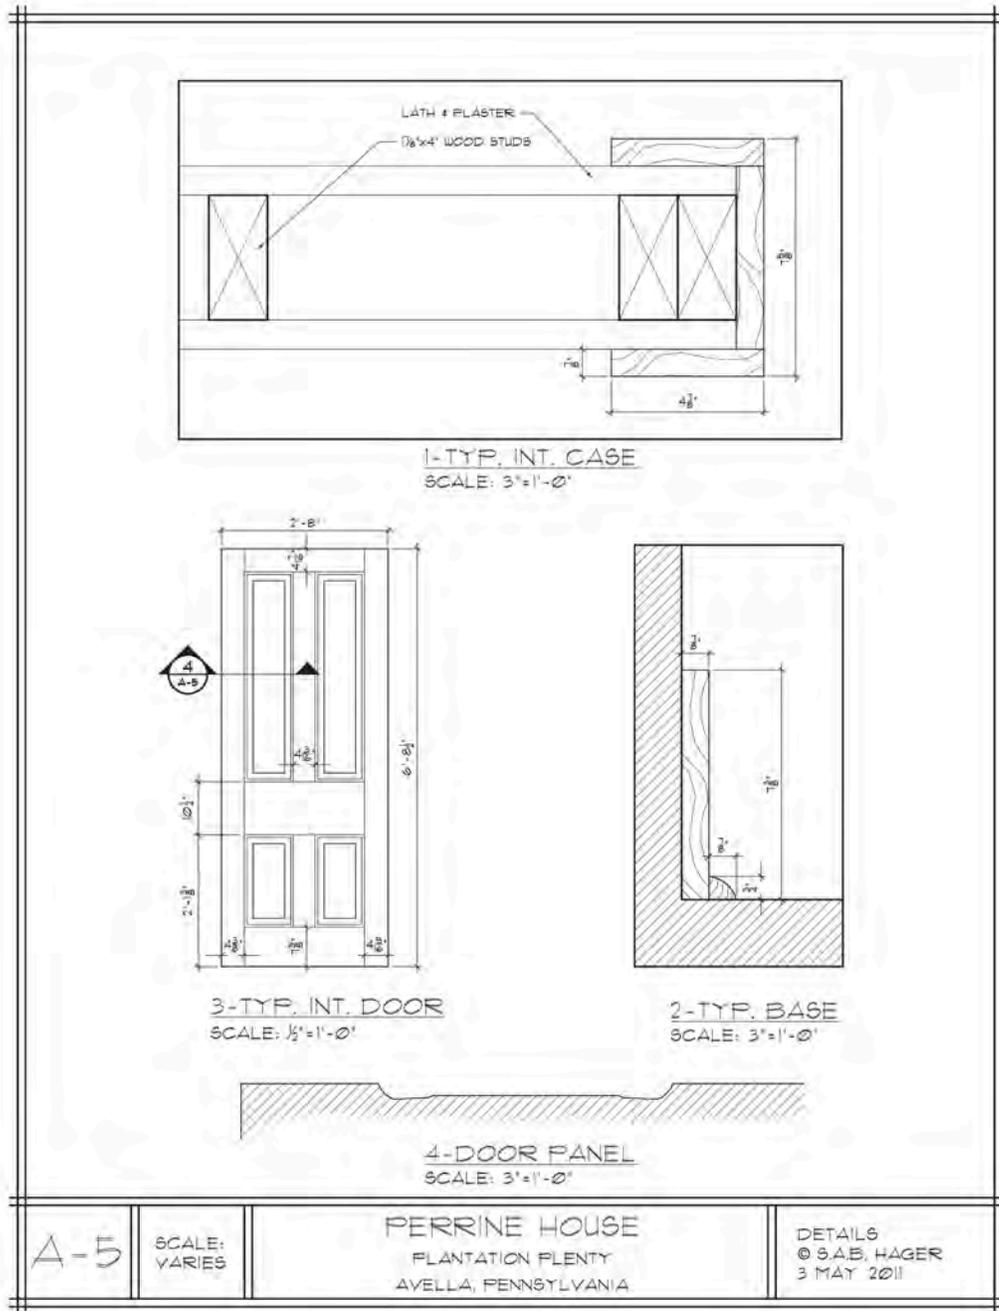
Plantation Plenty Perrin House Door and Door Casing Details
